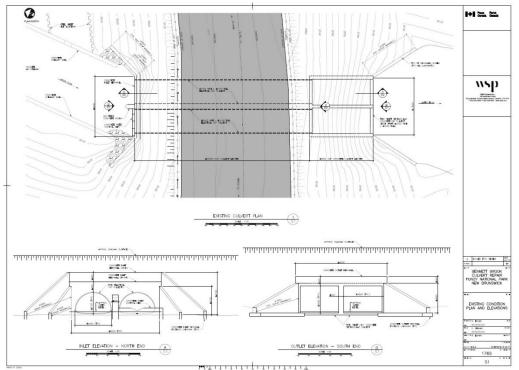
Plan and elevations of existing condition of Bennett Brook Culvert (WSP/Parks Canada - Digital Files).
